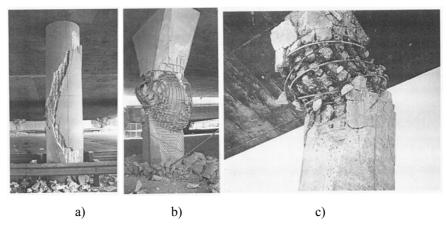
Failure modes due to lateral (seismic forces) in case of columns: a) progressive shear failure; b) buckling of longitudinal steel reinforcement; c) flexural plastic hinge failure [2]
